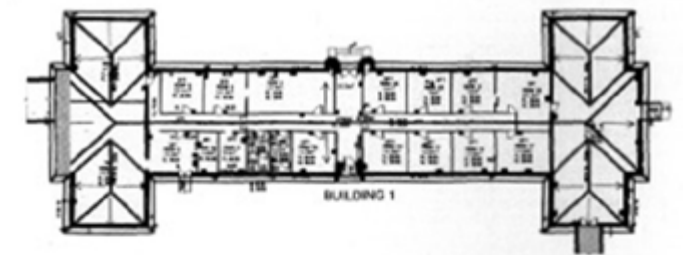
Plan of the Engineering School brick buildings, constructed in 1941
